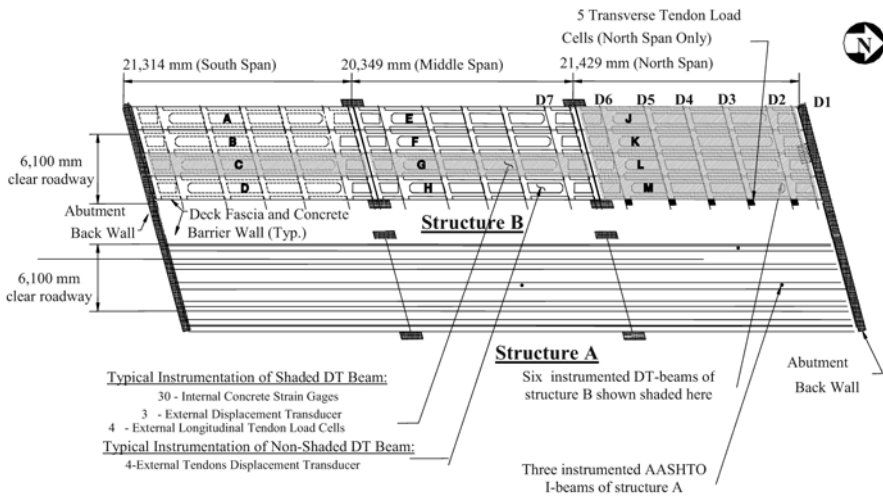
Instrumental and plan view of Bridge Street Bridge.
